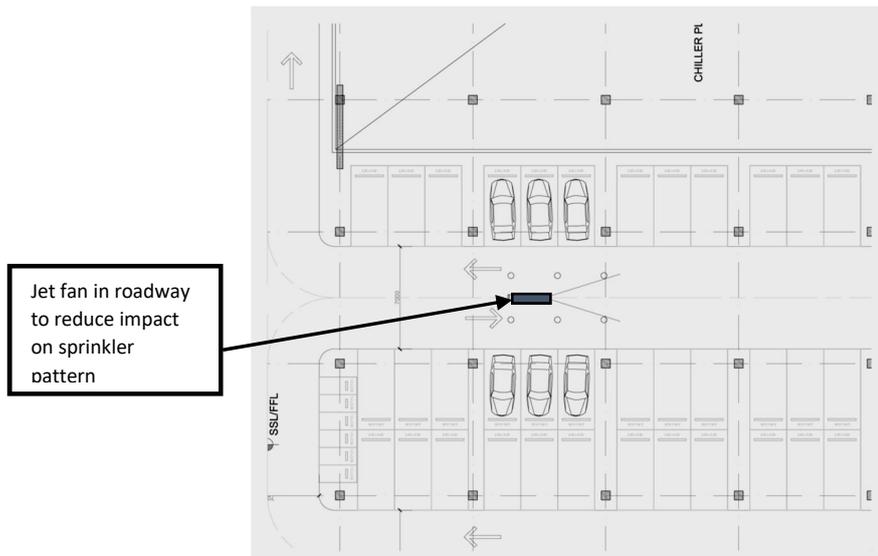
When a sprinkler system is installed, where possible always mount jet fans in roadways to minimise impact on the sprinklers.
